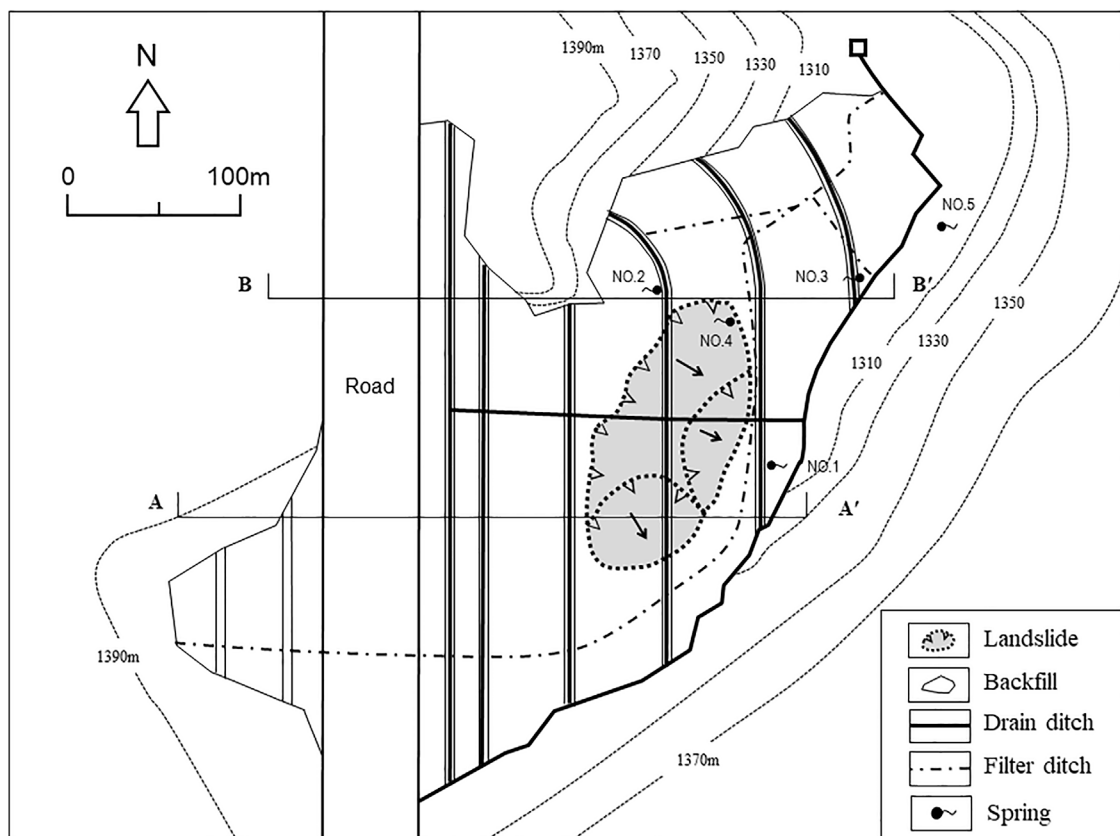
| Layout of the backfilled high embankment. A—A' and B—B' are section lines.
